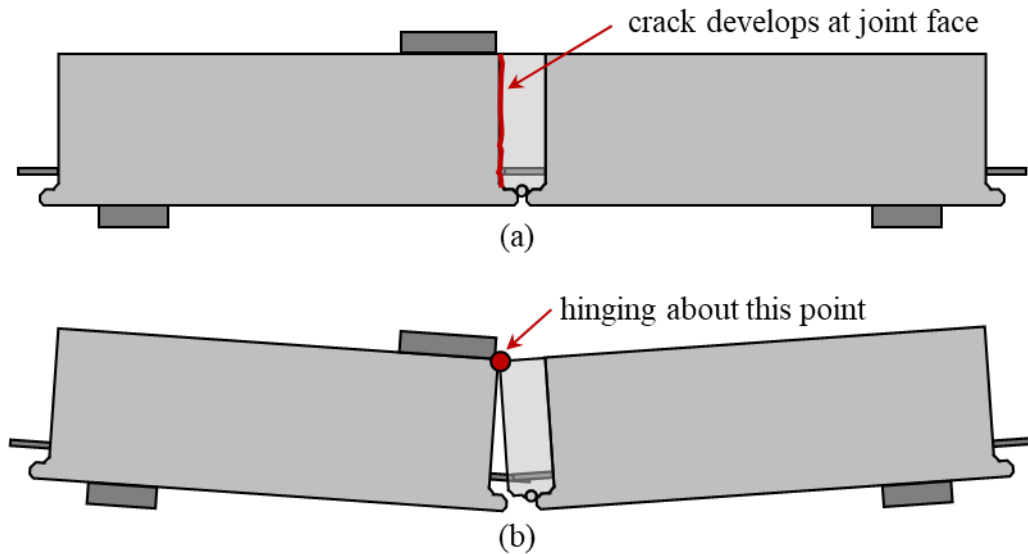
Typical failure mechanism for proposed 18-inch-deep joint specimens (18F2 is shown): (a) cracking at failure and (b) hinging in the precast section next to the UHPC joint
